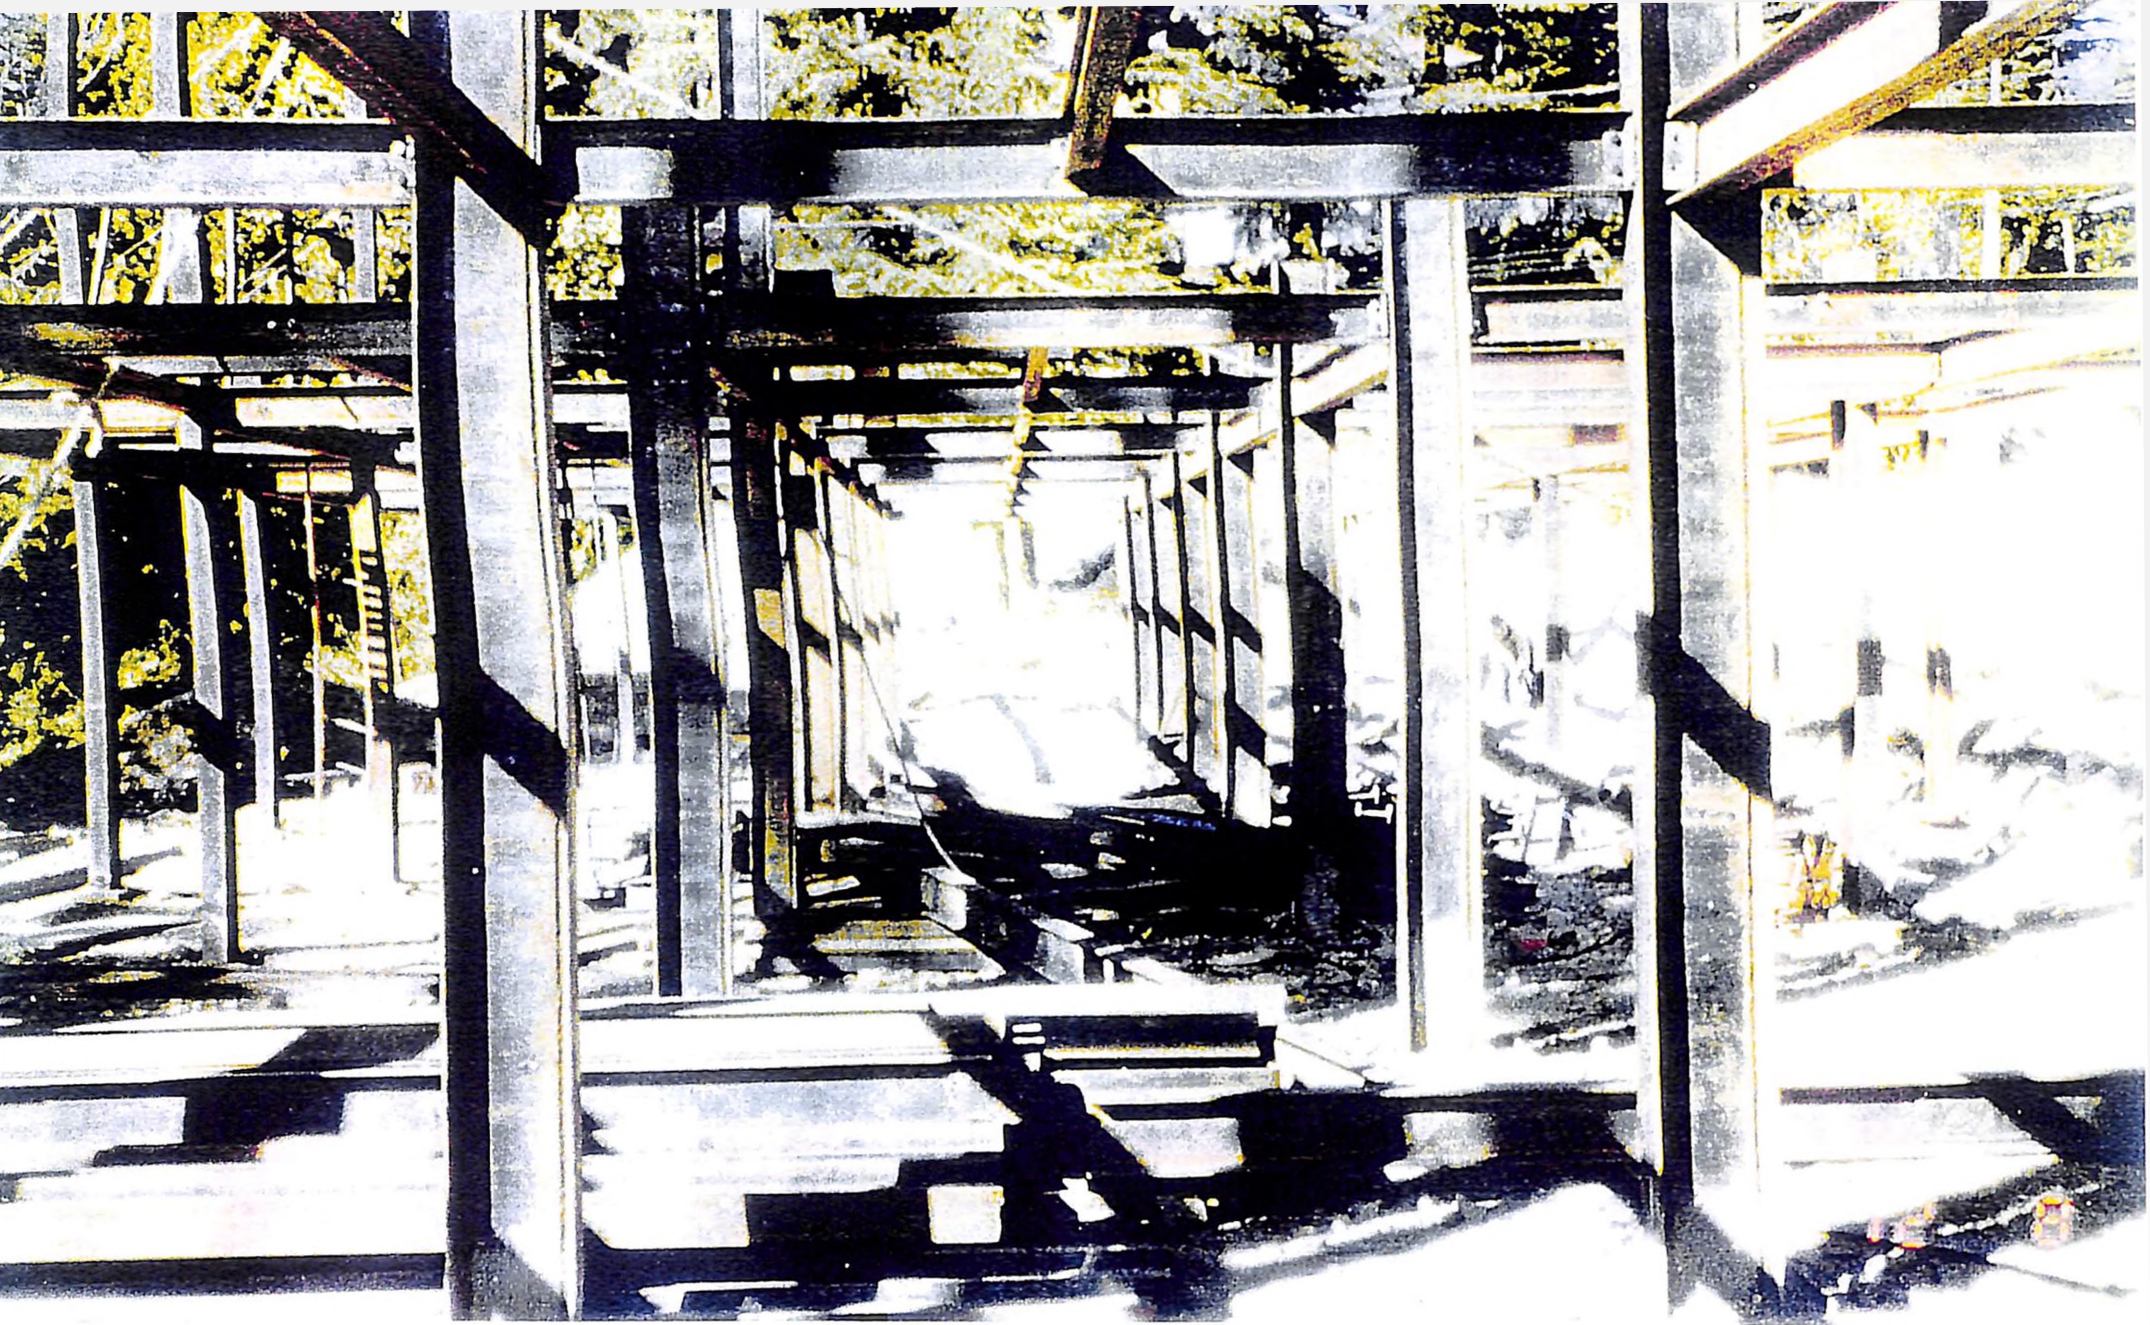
ERECTION OF STEEL STRUCTURE
